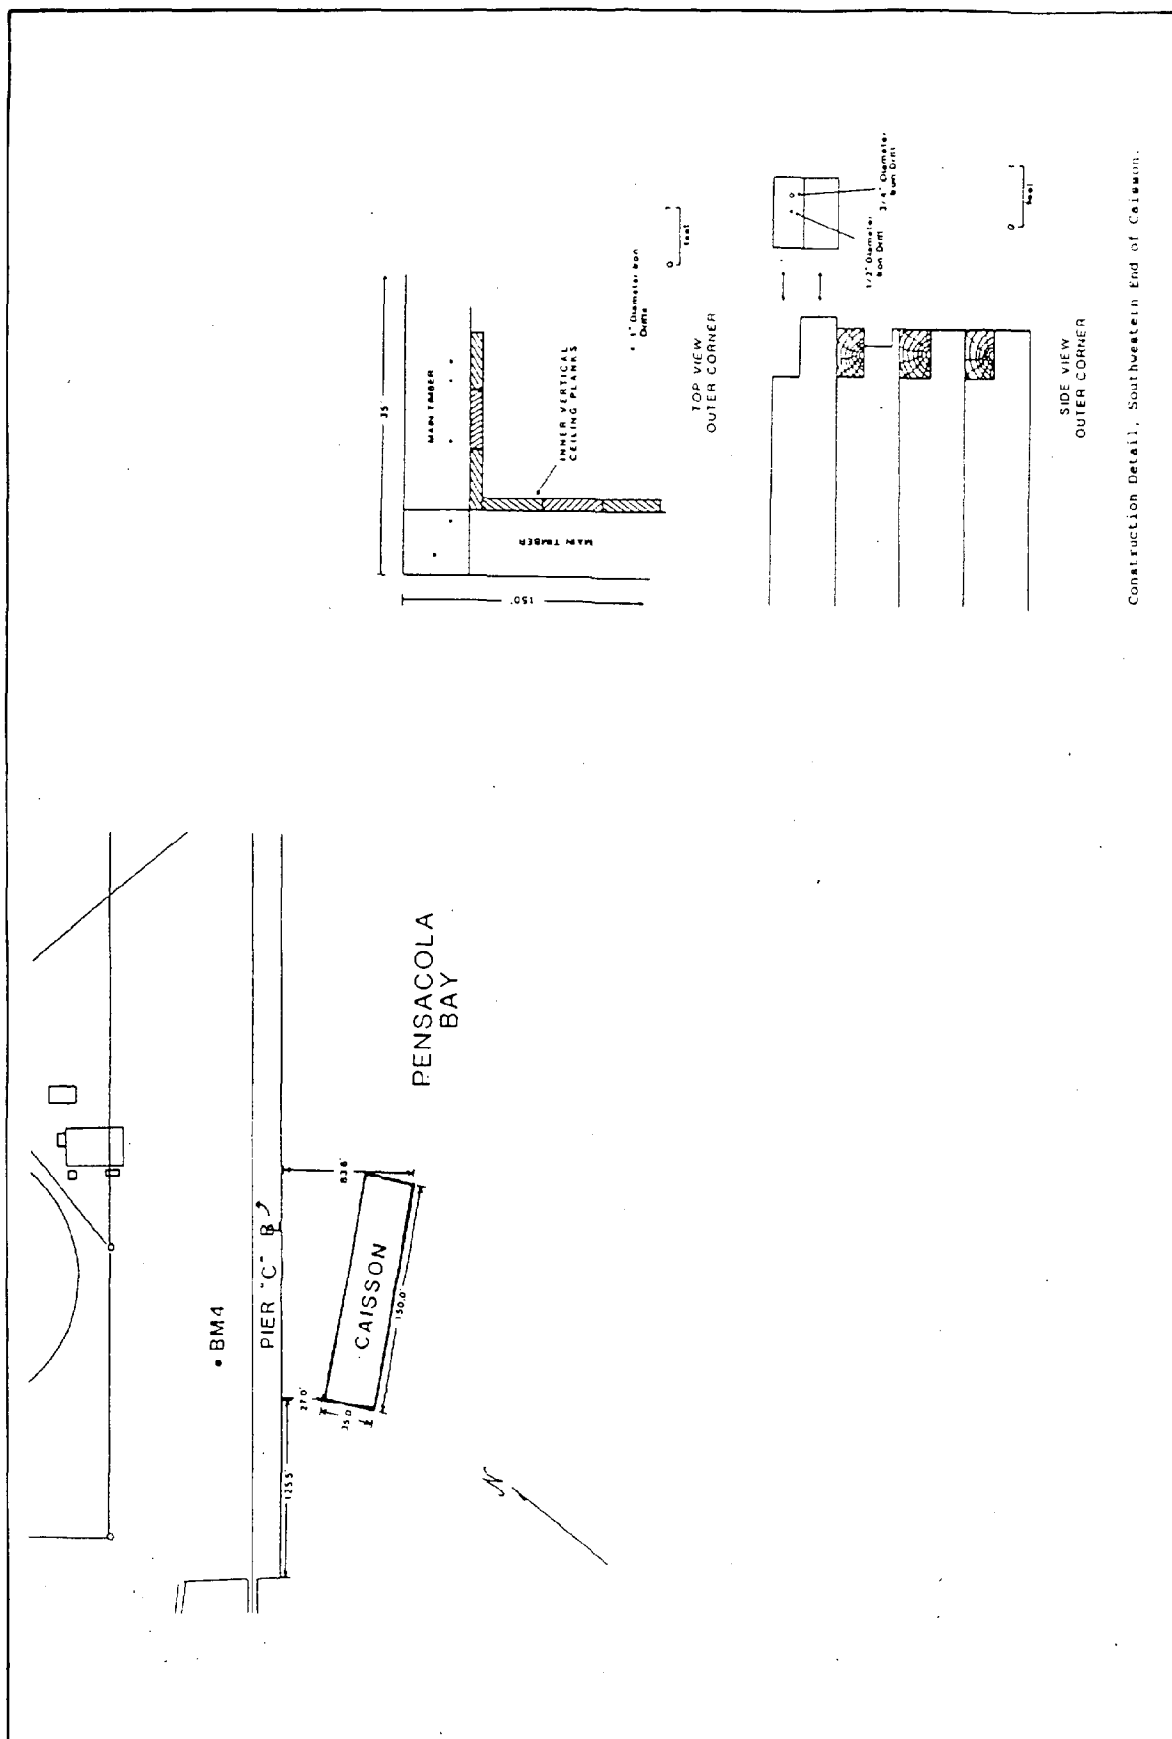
Site Plan & Construction Detail of 8ES1897, Brodie's Wharf Caisson.
